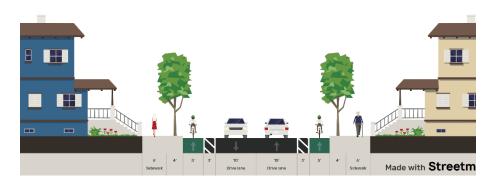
Segment 2 Proposed Cross Section on Centre Avenue from Bigelow Boulevard to Allequippa Street (looking west)
